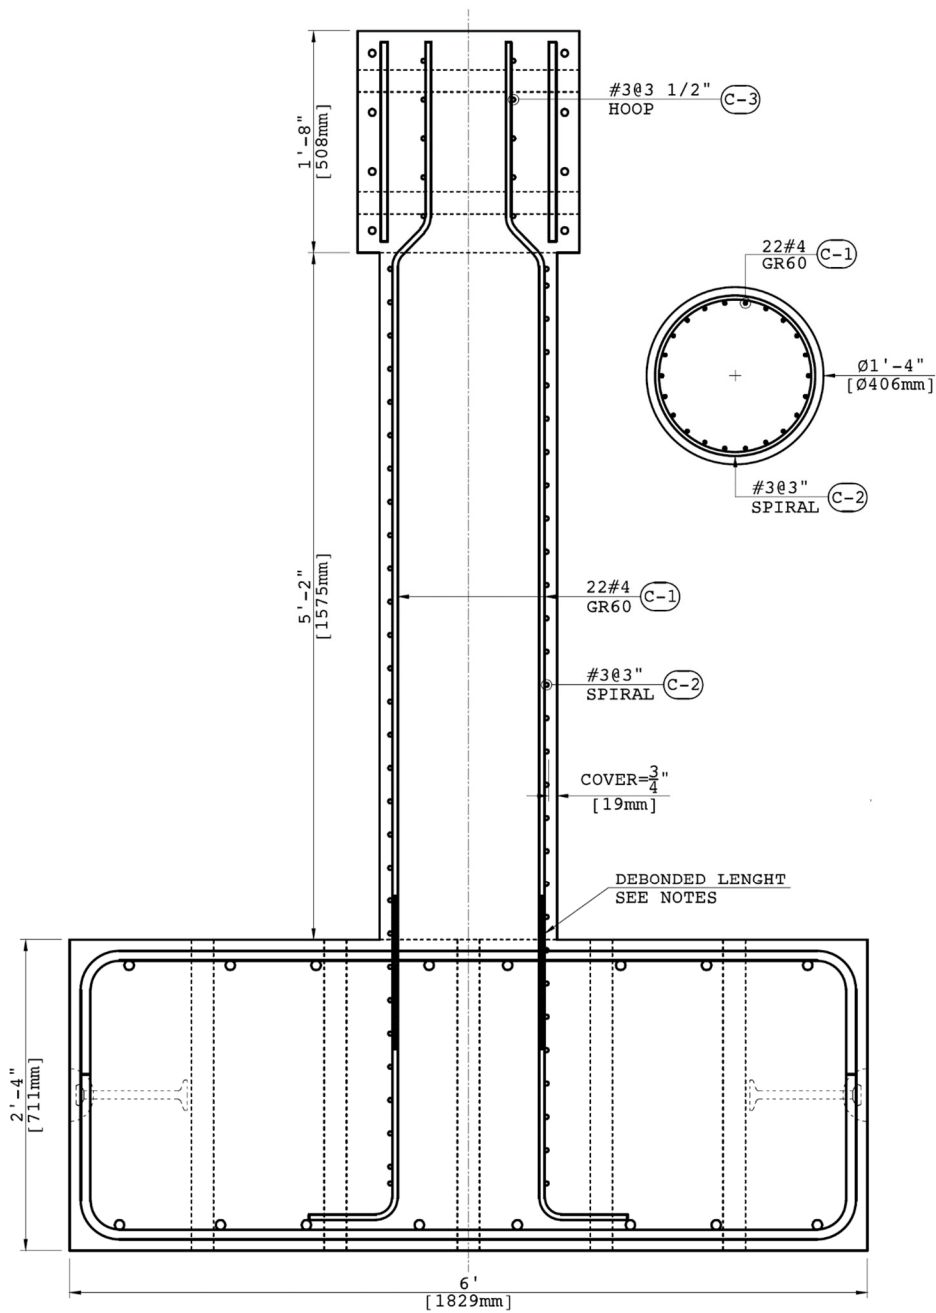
Column LD-S3-G60D: reinforcement details.
